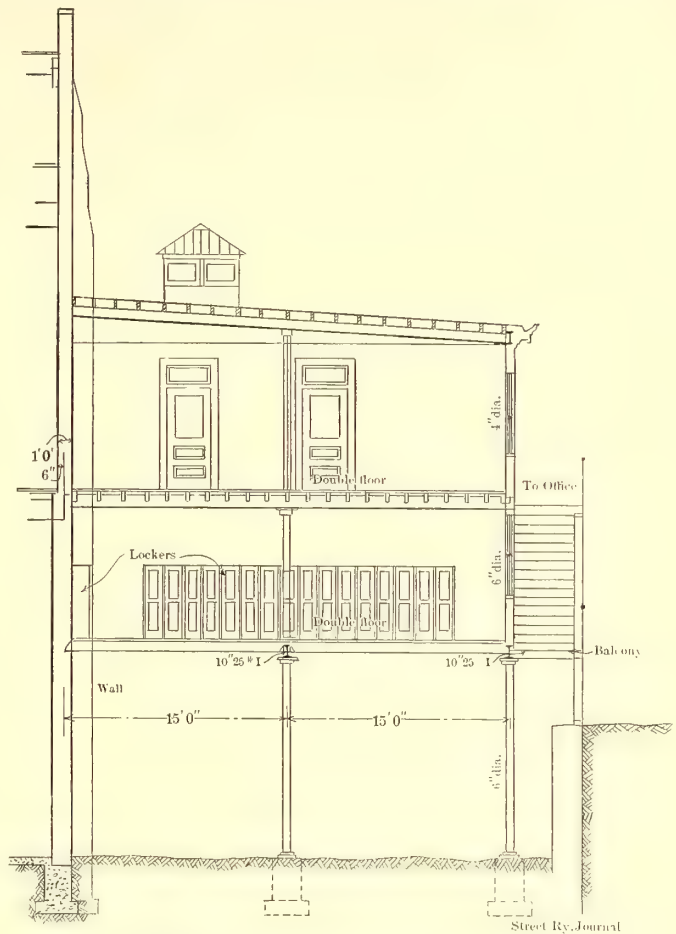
TRANSVERSE SECTION OF THE OFFICE BUILDING PROJECTING FROM THE MAIN SHOP STRUCTURE
